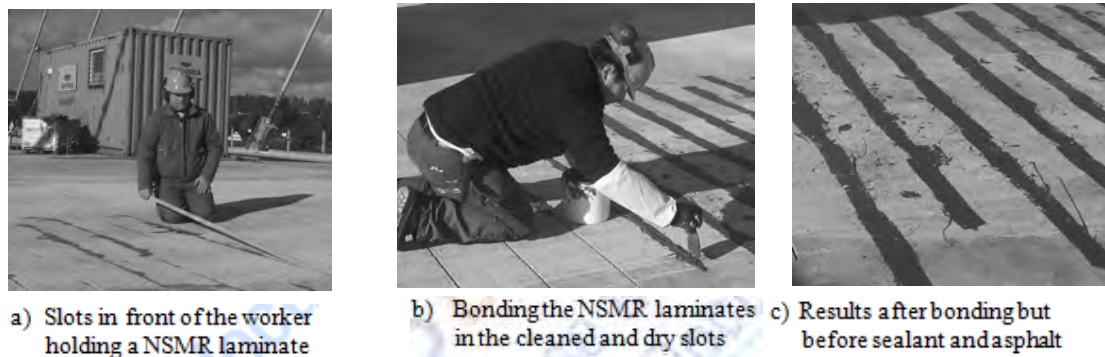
STRENGTHENING OF A CONCRETE JOINT WITH NSMR
